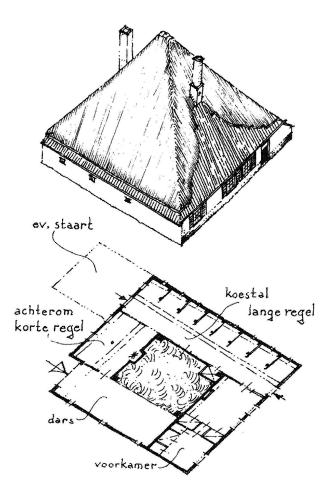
Isometric projection and ground-floor plan (*Noord-Hollandse normaalstolp*, n.d.).
